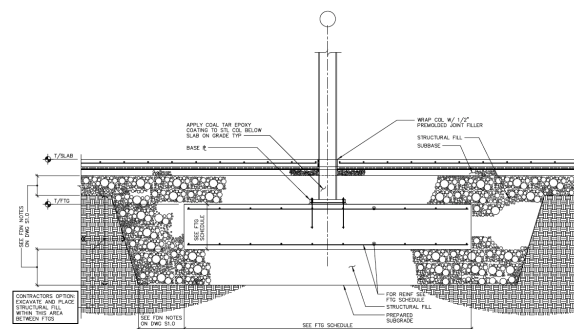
| Section of Typical Interior Footing | 4/S3.02
